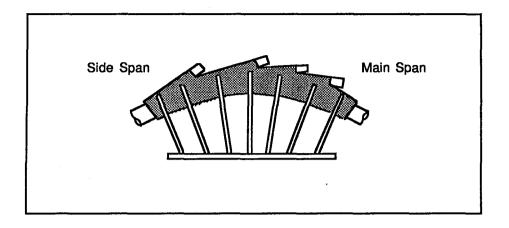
SUSPENSION BRIDGE CABLE SADDLE
